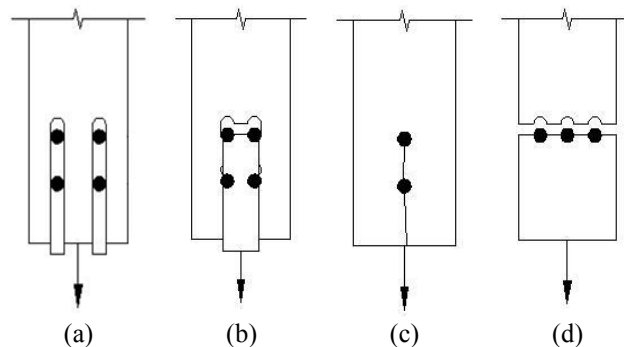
Possible modes of brittle failures in bolted wood joints (a) row shear; (b) group tear-out; (c) splitting; and (d) net tension [22]
